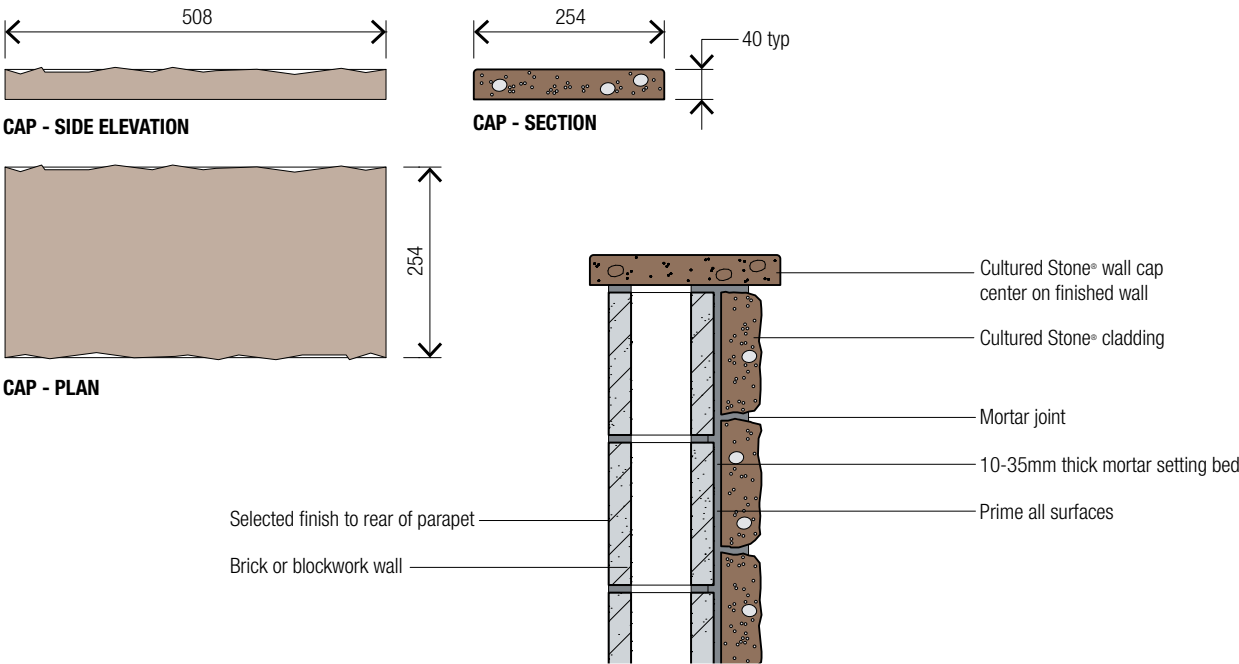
Brick or Block Work Parapet - Section (Dwg # CS-11.02)
